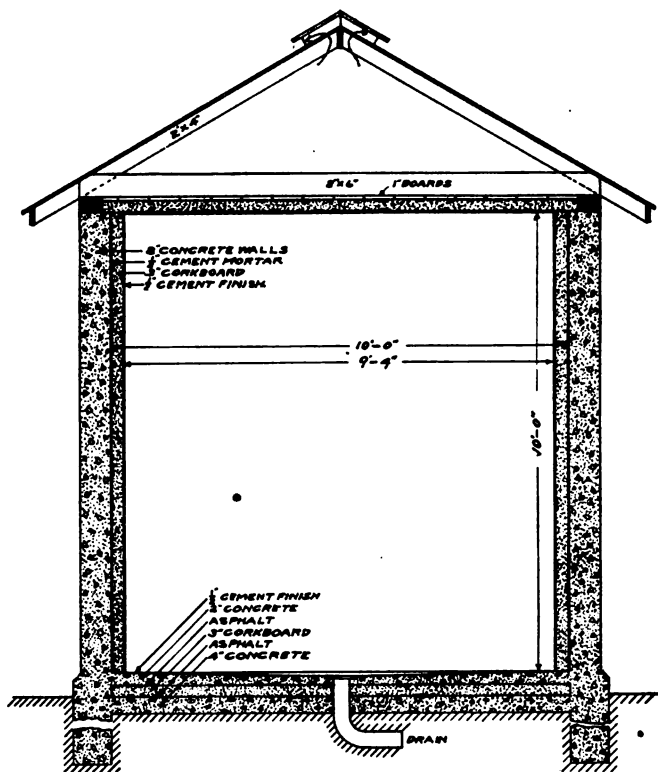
Small concrete ice house. (Section on A-B of fig. 10a.)
